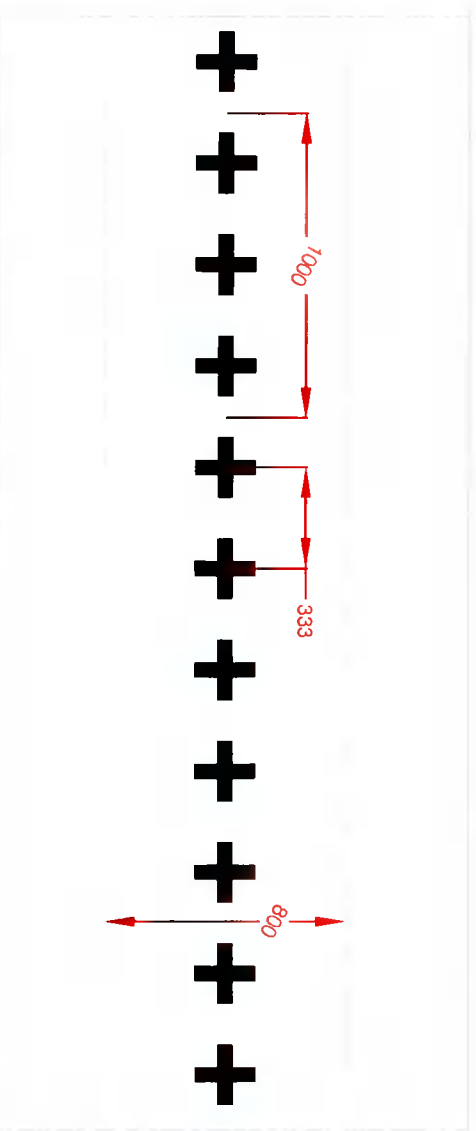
TYPICAL DOUBLE STAKING DETAIL
